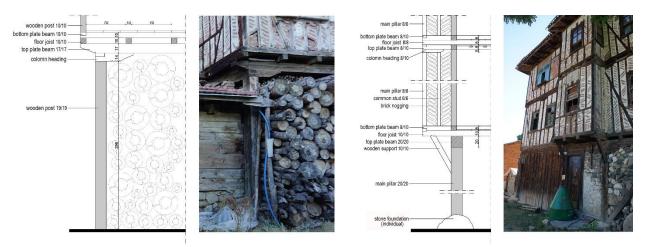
(a) Ground floor system detail of house number 23 (b) System detail of the first and second floors of the house number 63
